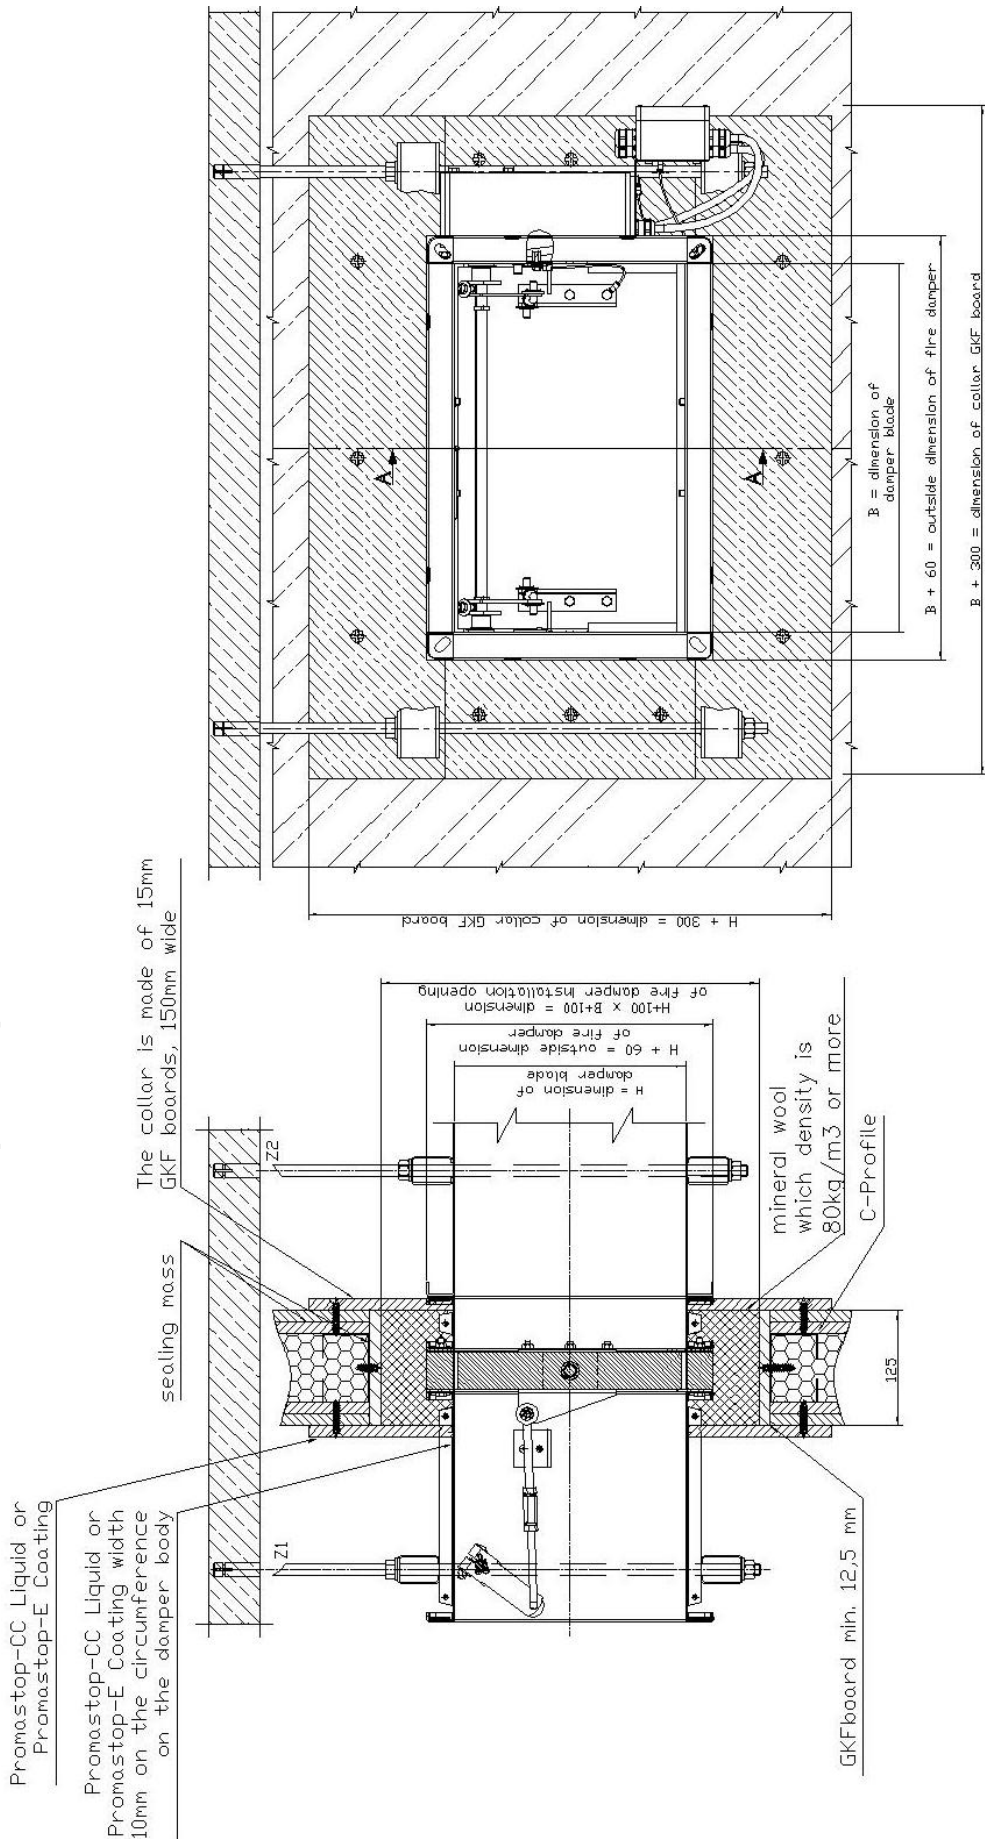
Installation method of fire dampers KWP-O in flexible wall
